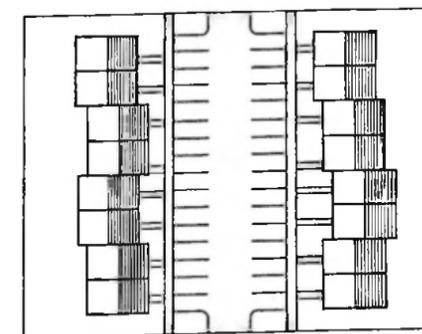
Avoid too much paving in parking spaces and sidewalks on both sides.
